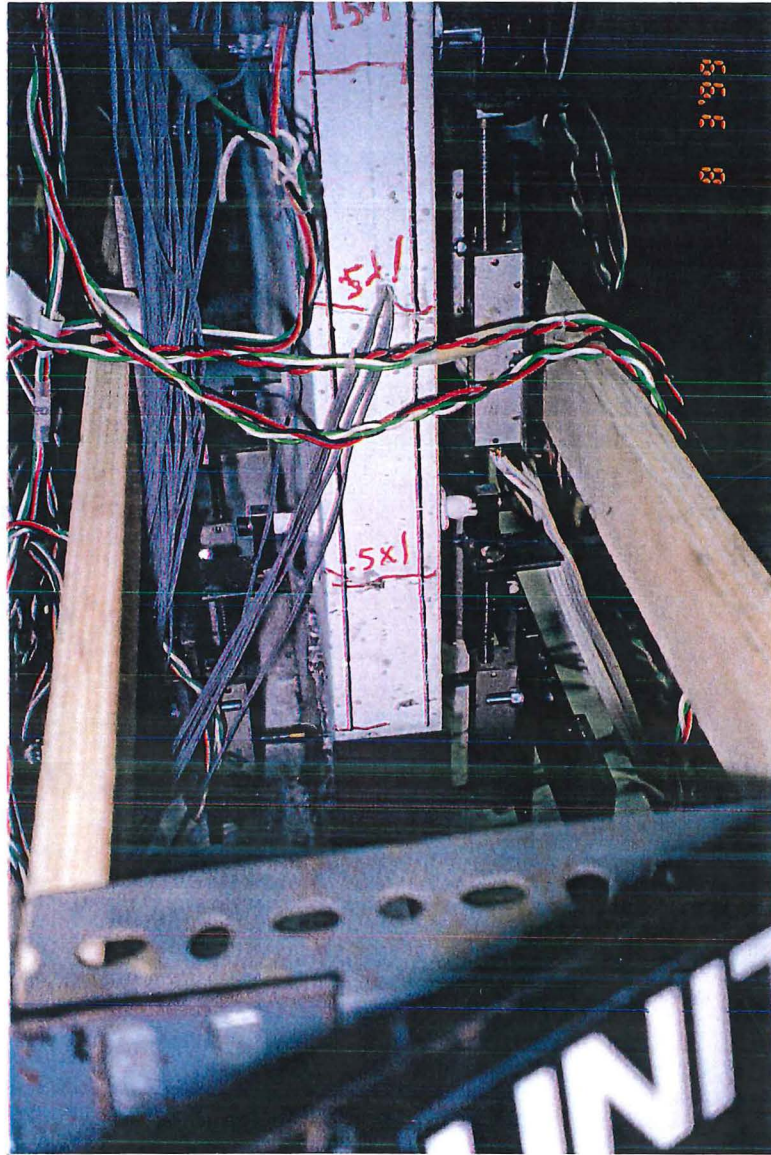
Unit 3: Spalling of concrete due to twisting action at $\mu_A = -3.5 \times 1$ (East edge)
